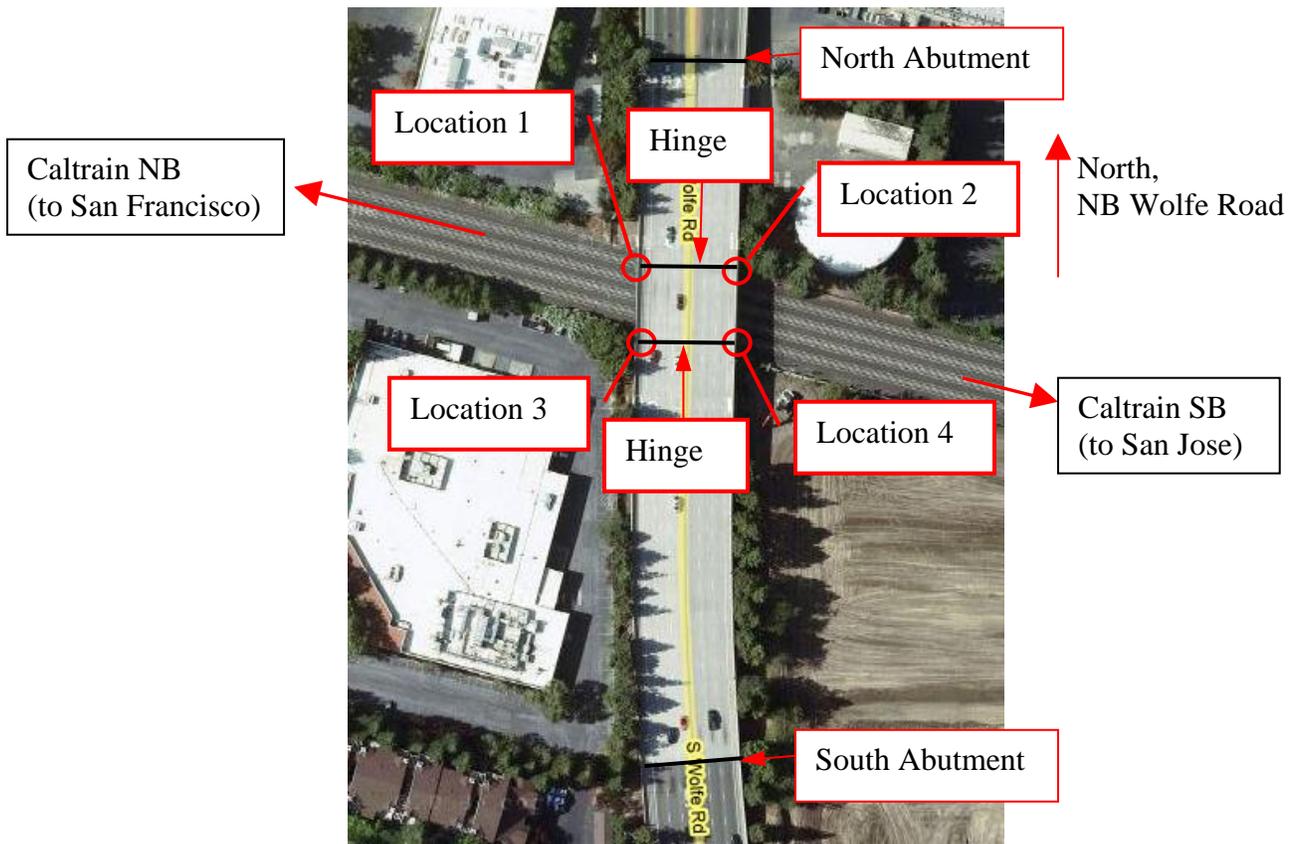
Aerial View of Wolfe Road Overhead, Hinge and Abutment Locations.
